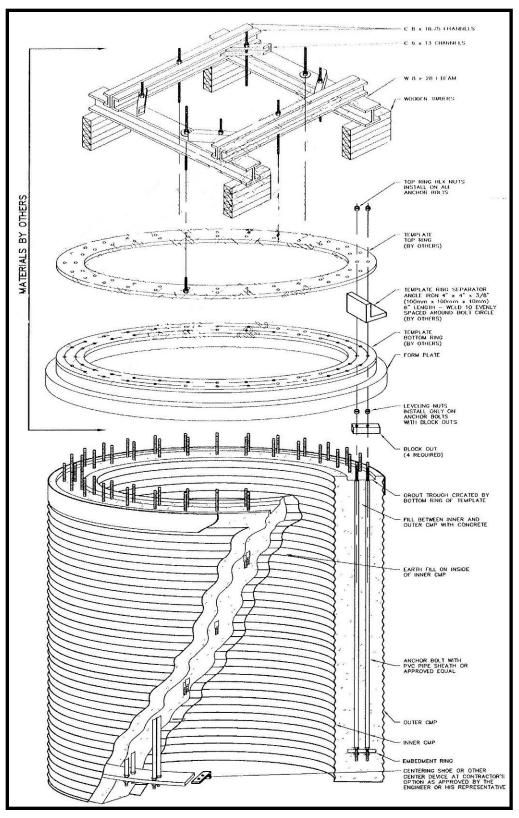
Typical WTG Tensionless Tub Foundation
